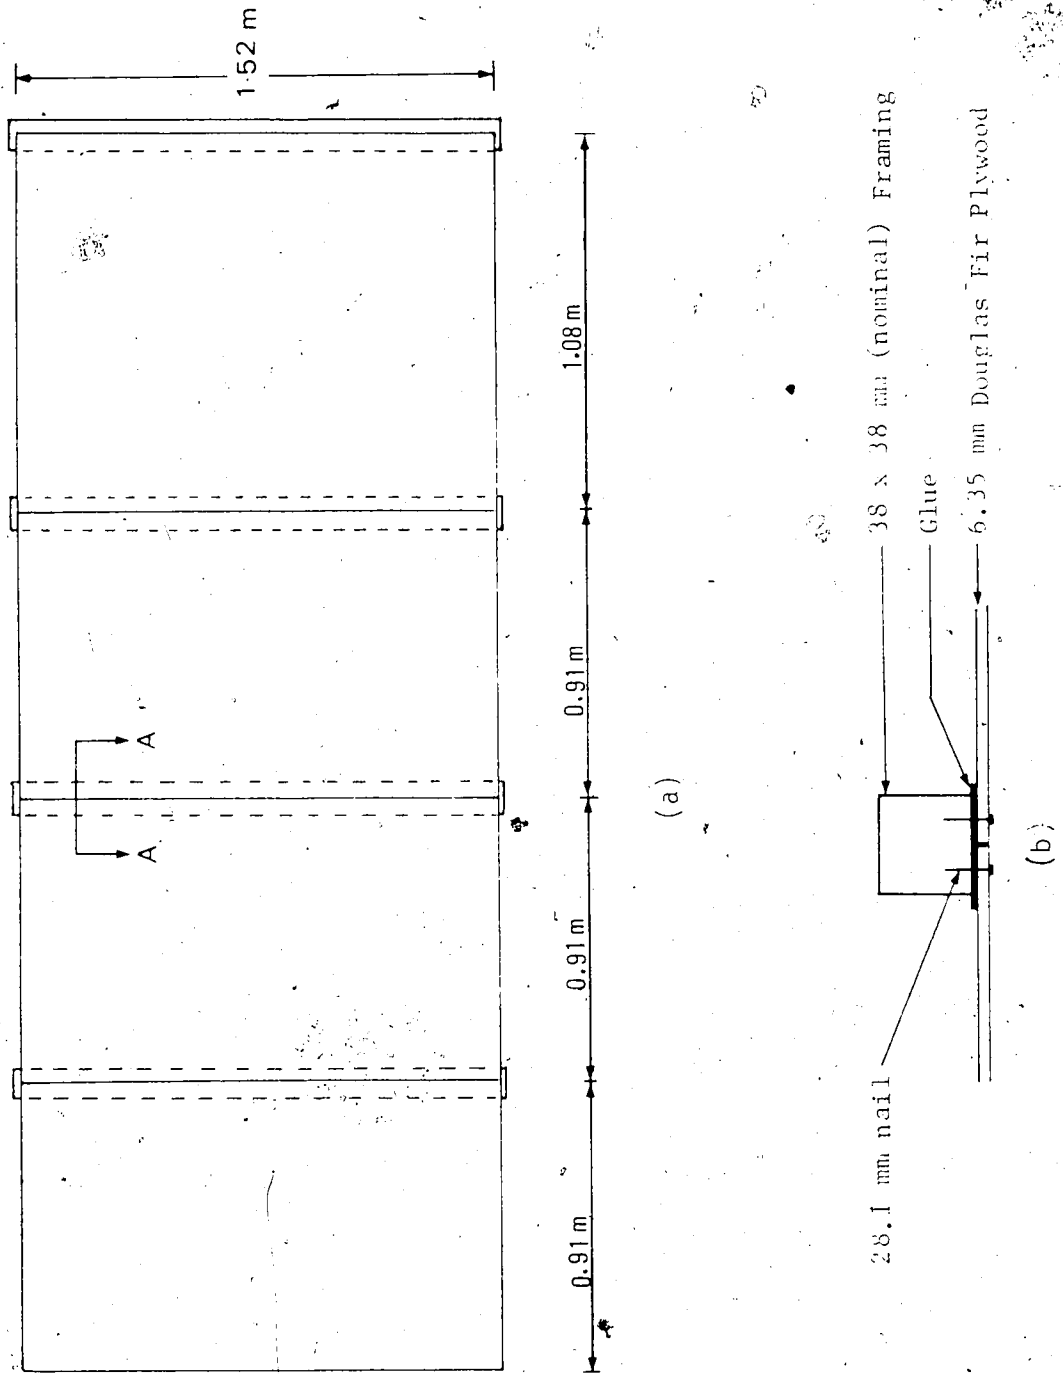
(a) Plywood bin wall panel (inside face).
